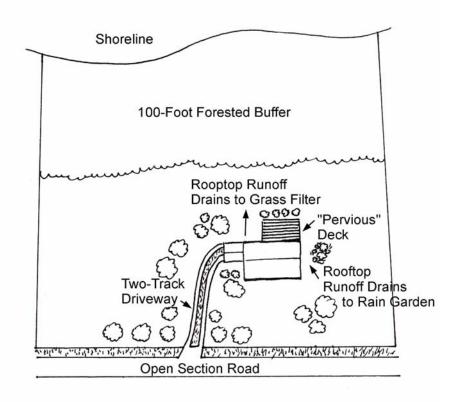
Illustrative Example of How Multiple Non-structural Stormwater Techniques Can be Applied at a Residential Site
